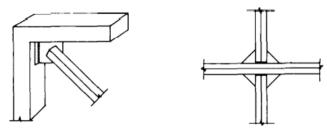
Connection detailing in both concrete steel bracings connection and steel cross-bracing connection [41].
